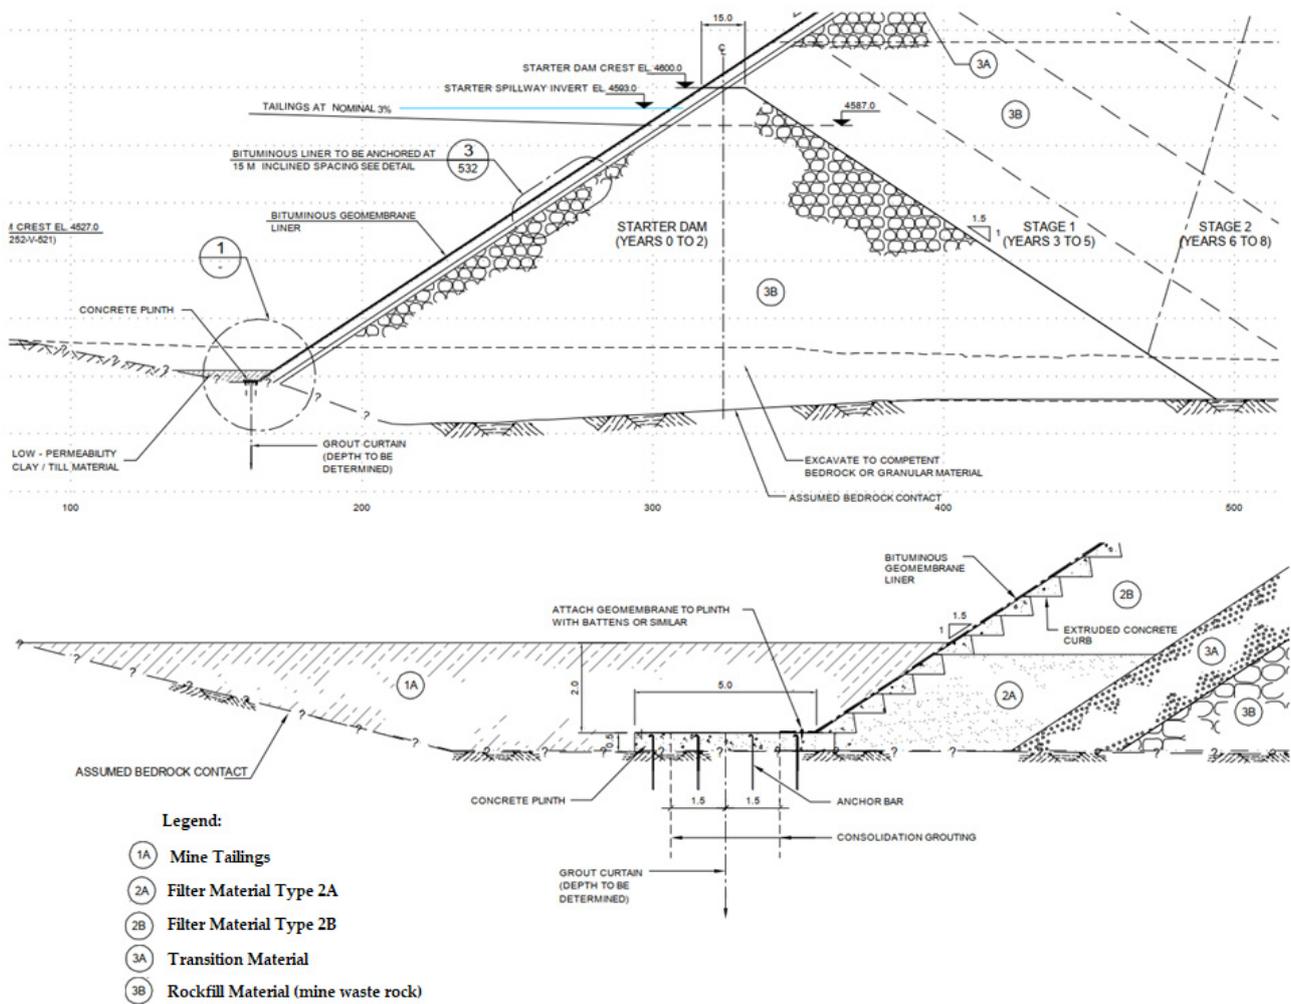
Mine waste rock dam upstream face waterproofing with bituminous geomembrane—construction details.
